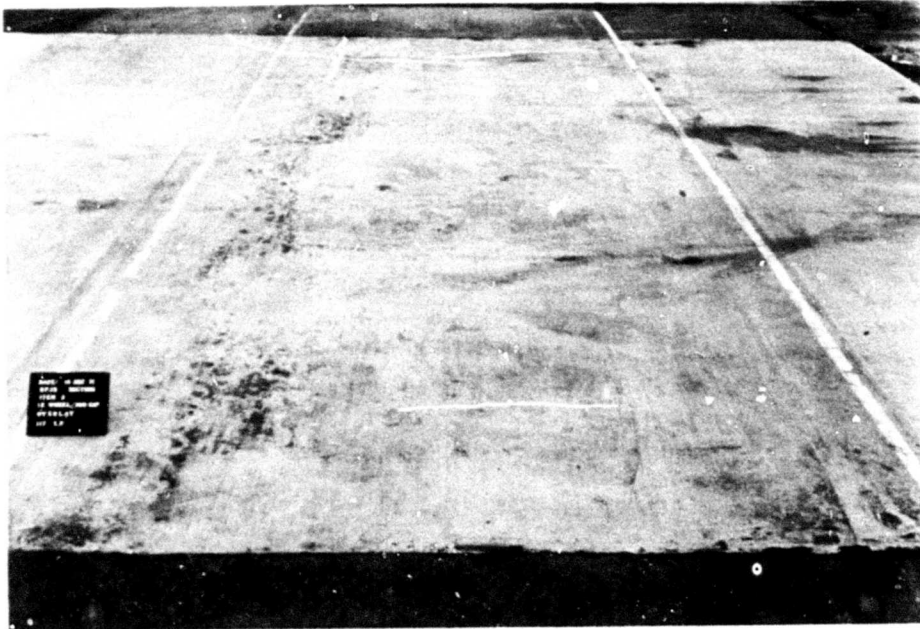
Condition of 4-in. Thick Fibrous Concrete Overlay After 2575 Traffic Loadings. NOTE: These loadings do not include the 950 loadings placed on the 10-in. plain concrete base slab
